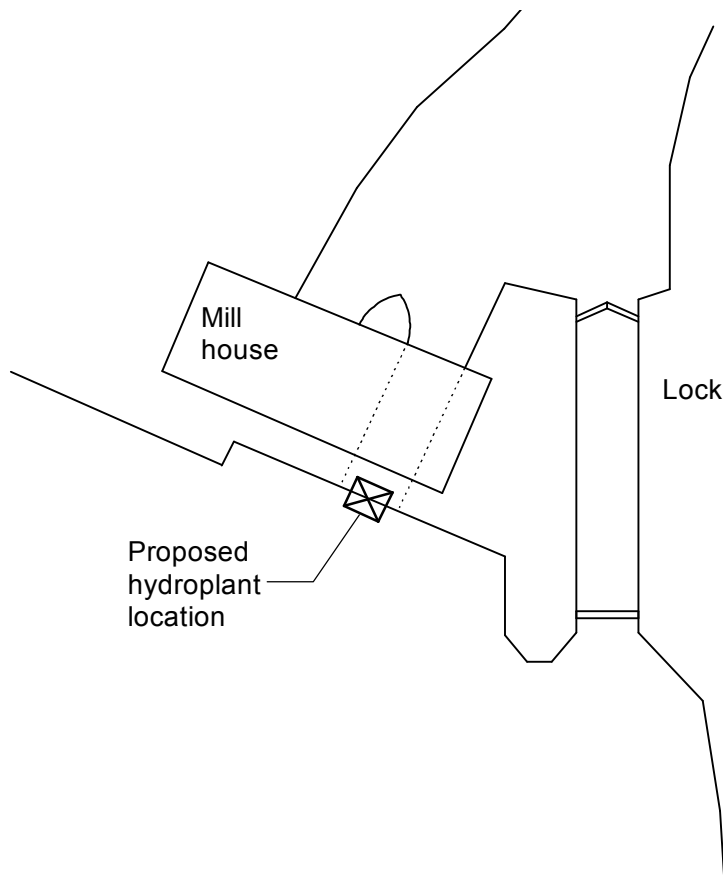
Schematic layout of Titchmarsh lock and proposed hydropower plant
